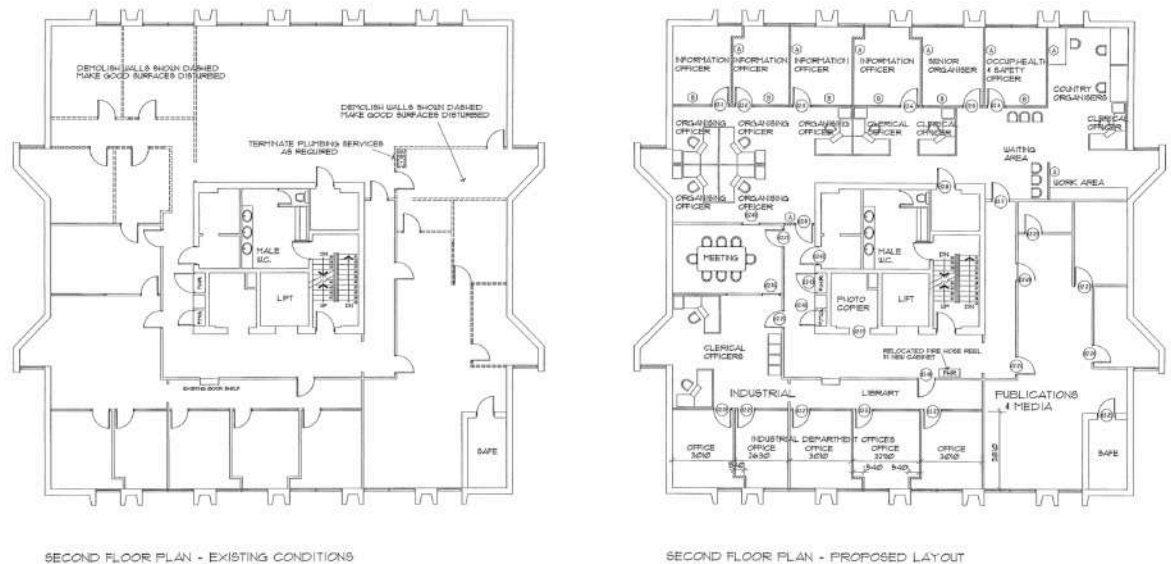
Existing and Proposed Second Floor Raggatt House, 1993 [Source: Resource Development, Drawing No. 93-
